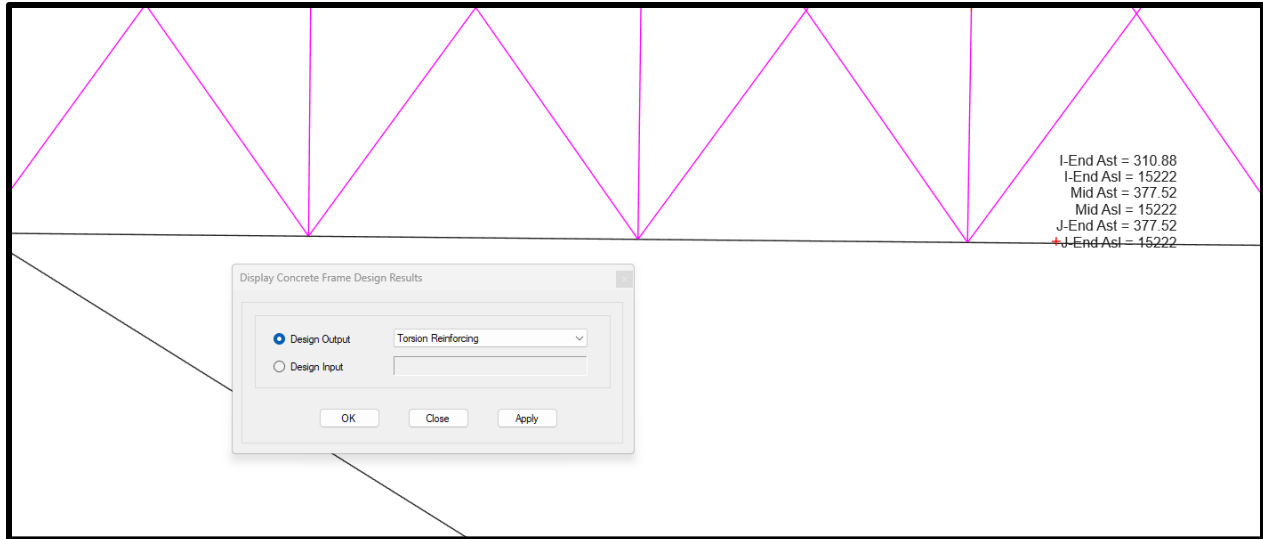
Torsional Reinforcement for Outrigger Beam
